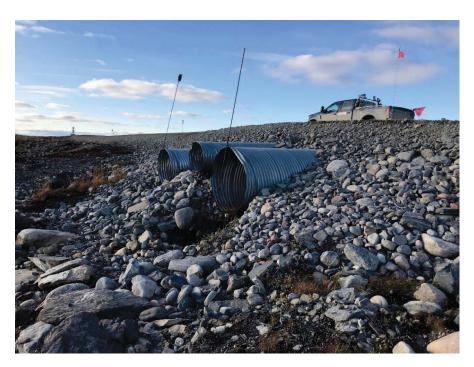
to 66 were taken at KM16.3 where there are 3 CSP culverts. Some minor deformation of one culvert and erosion visible at the outlet of the lowest culvert.
